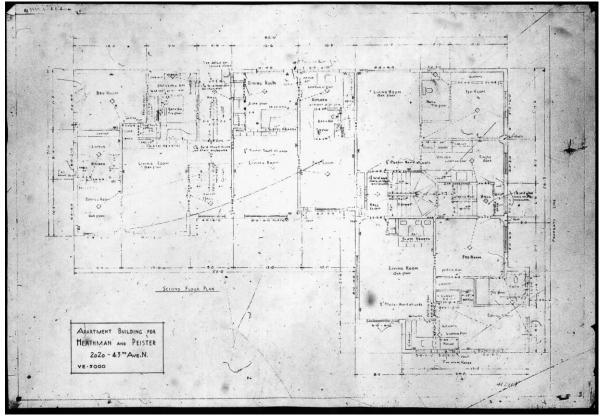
"Apartment Building for Heathman and Peister 2020-43rd Ave. N. ... [Building Permit] 412969'
